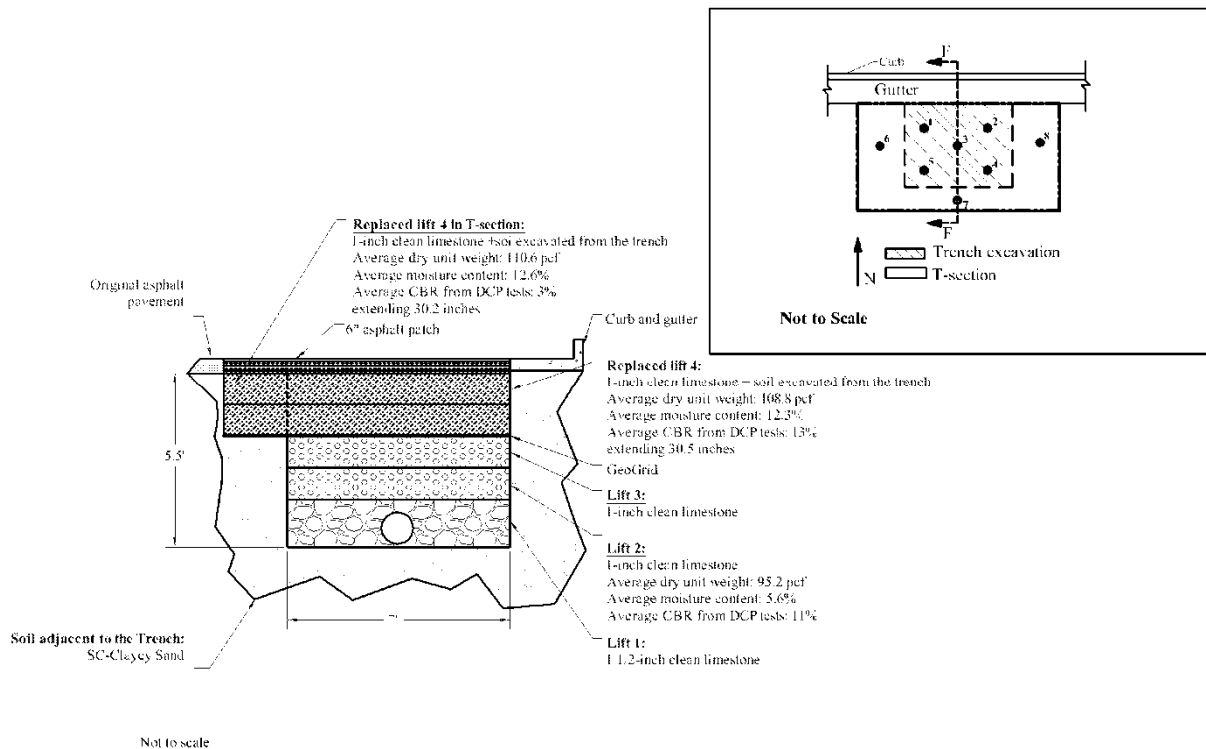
Cross-section of Trench F on July 18, 2007; (a) plan view, (b) cross-section
